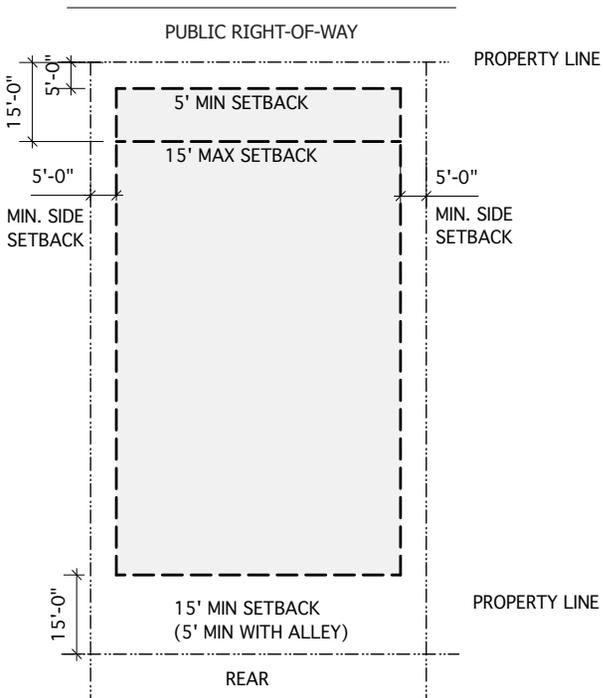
SU-2/VTSL BUILDING PLACEMENT DIAGRAM
